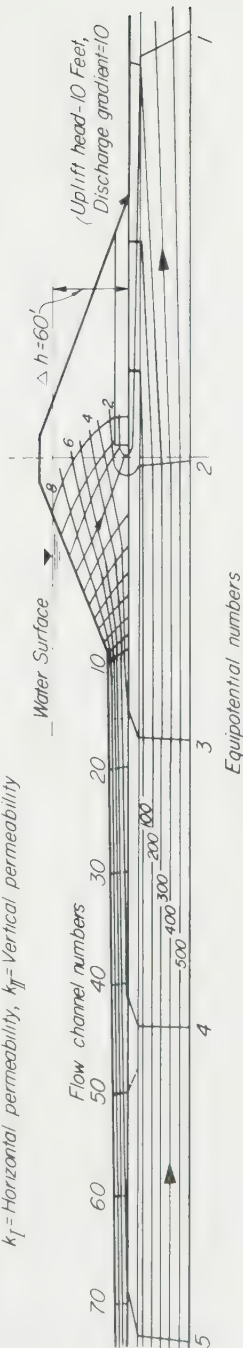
Flow net for anisotropic embankment and blanket placed on anisotropic foundation. (After H. R. Cedergren.)
